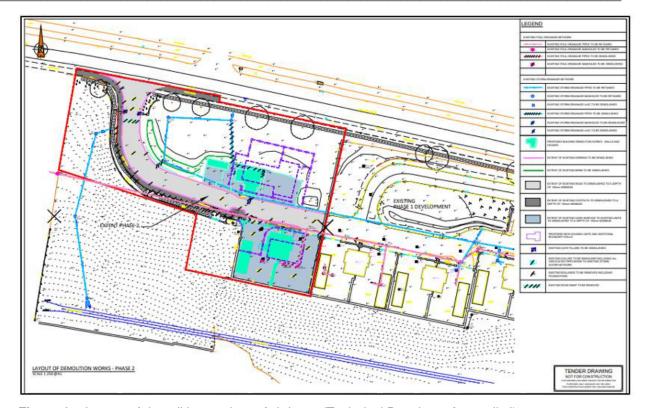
Layout of demolition works at Ash Lane (Technical Drawings, Appendix I)
